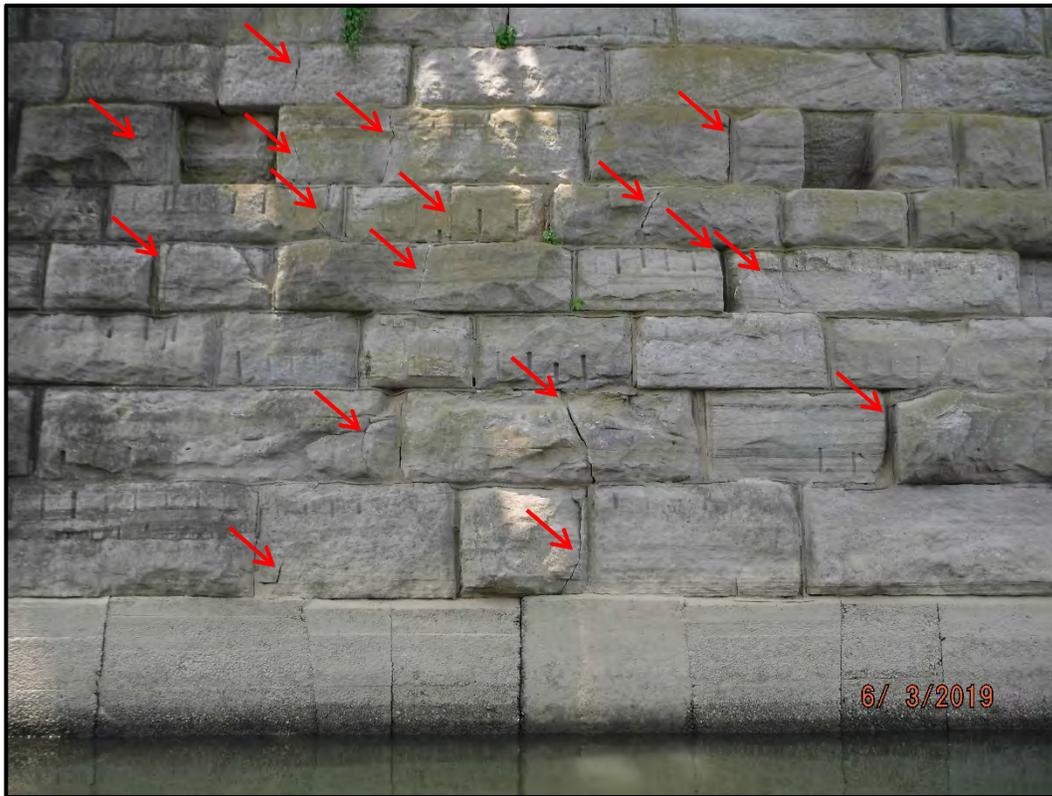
Minor cracking throughout the middle of the Pier 6 east face. Note the stones at the waterline are encased in concrete and have vertical cracks spaced at 2ft.
